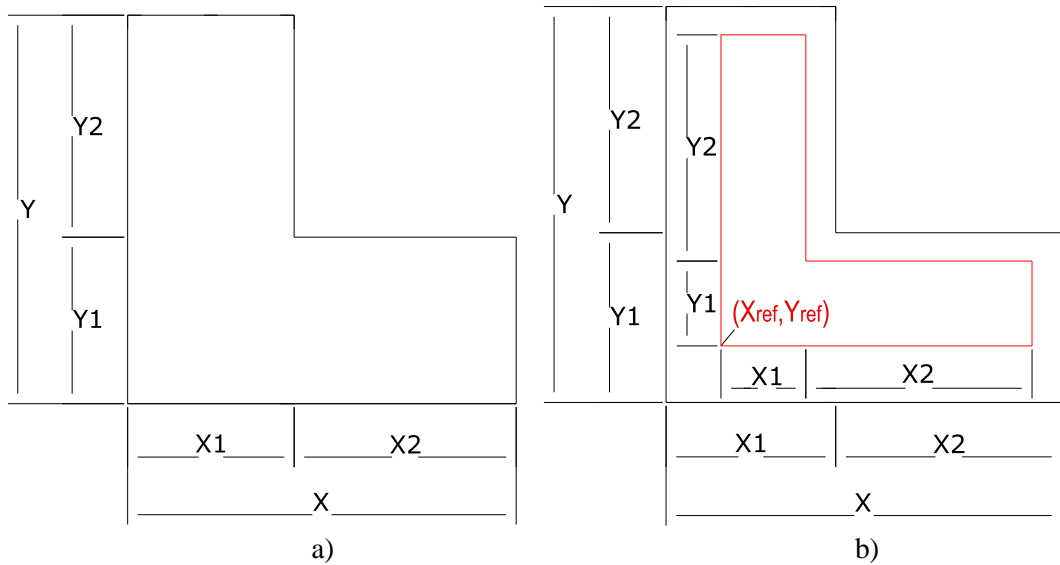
Dimensions of floor plan a) with no offset and b) with upper storey offset
